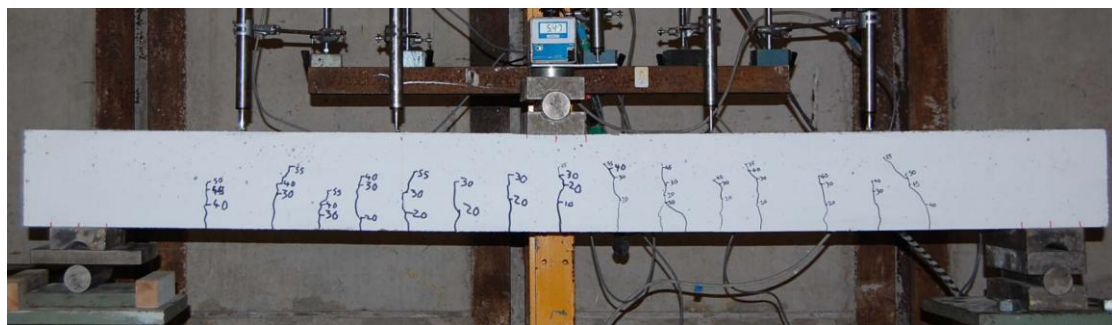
Crack patter for specimen 9C-U-S at 45 kN
